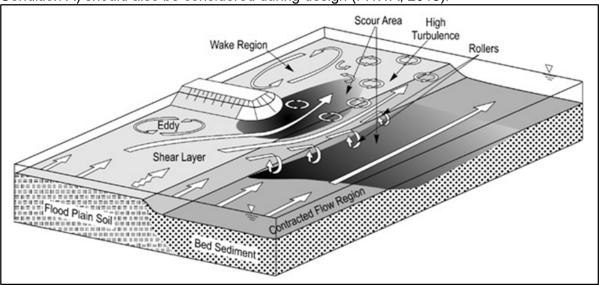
Illustration of abutment scour conditions (NCHRP 2011b).
